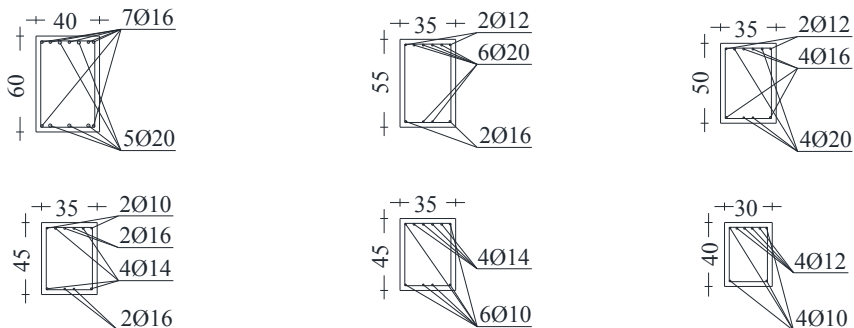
Section and arrangement of columns and beams reinforcing bars for Italian building
